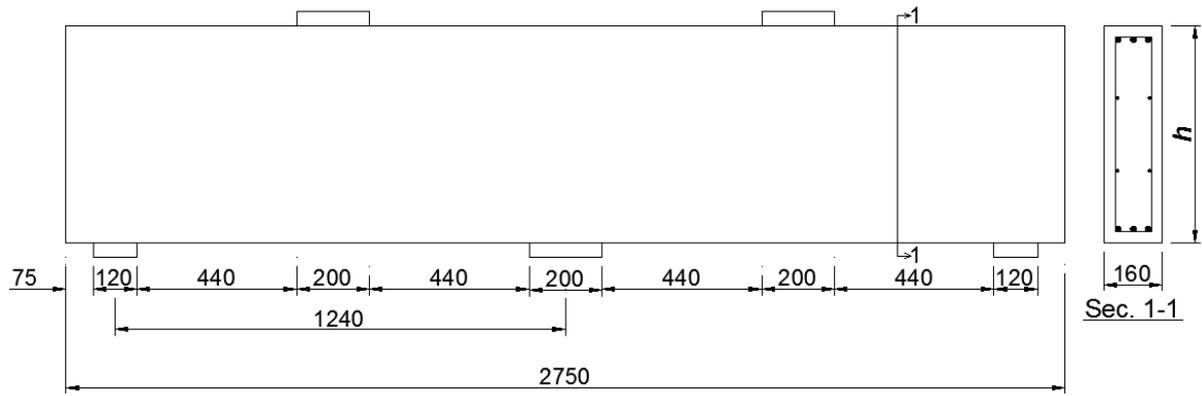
Geometrical dimensions of the beams tested by Khatab et al.^[17] (Dimensions in mm)
